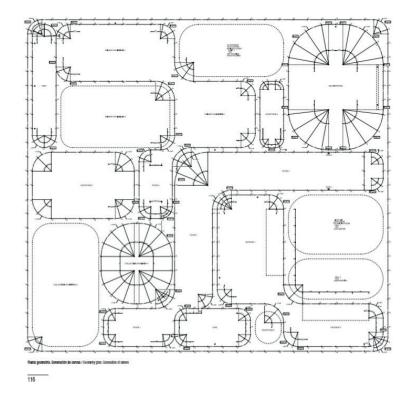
Detailed plan, Toledo museum, SANAA (2001) • Source: El Croquis
